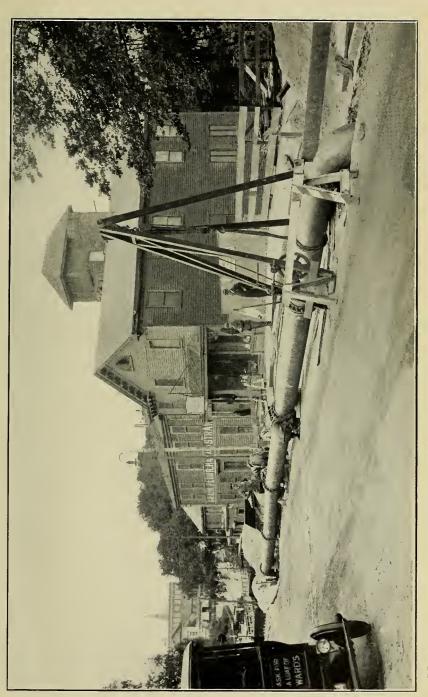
PLATE VII.—TEMPORARY WATER MAIN, USED DURING THE CONSTRUCTION OF THE NEW BRIDGE AT ADAMS STREET, MILTON.
